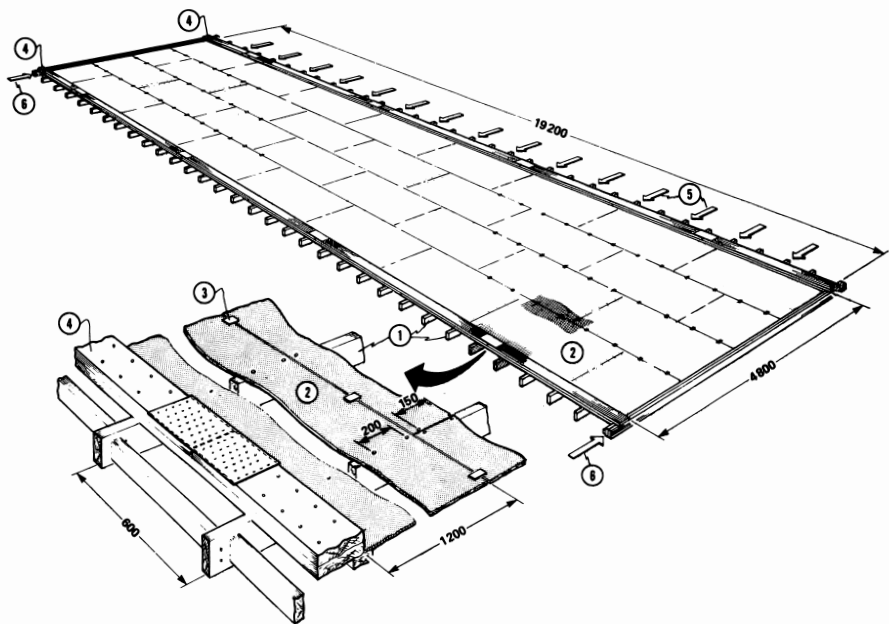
Details of conventional plywood ceiling model. (1) 38 × 140-mm members represent ceiling joists or roof trusses; (2) 7.5-mm sheathing fir plywood, nailed to (1) at 150-mm spacing across ends and 200-mm spacing to others; (3) 7.5-mm steel plyclips midway between (1); (4) beam edge of 2.38 × 184-mm planks with steel splice plates at each staggered butt joint; (5) 15 hydraulic cylinders spaced at 1200 mm; (6) two reaction pads with load cells, anchored to warehouse floor.
